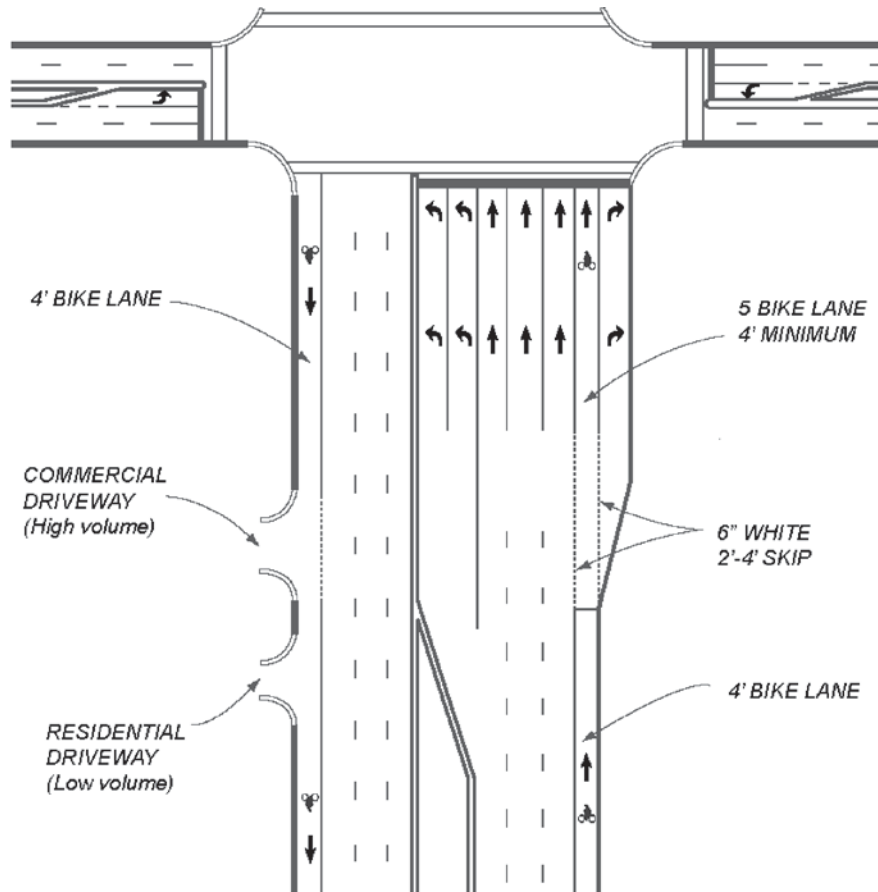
Major intersection with separate right-turn lane urban typical section (curb and gutter) (70).
